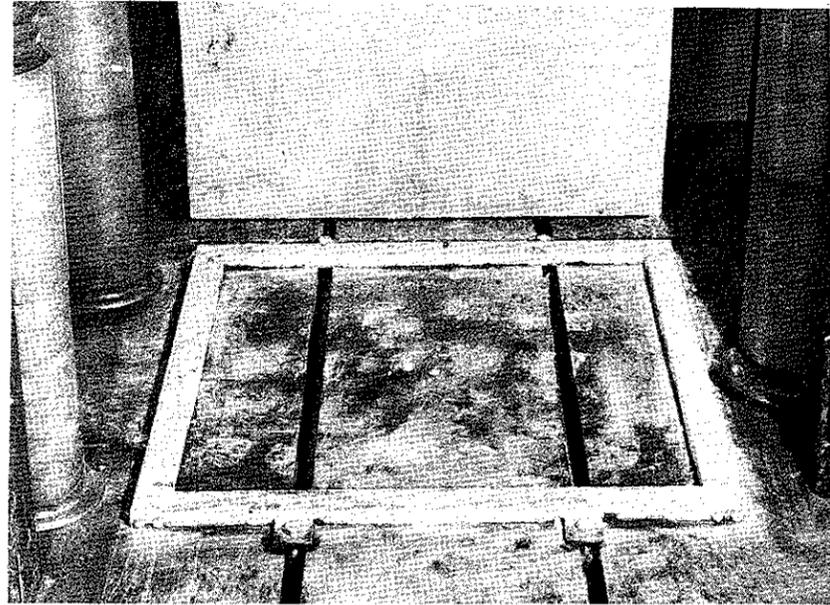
STEEL SUPPORT RING USED IN SERIES C BOLTED IN PLACE ON WEIGHING PLATFORM OF TESTING MACHINE.
